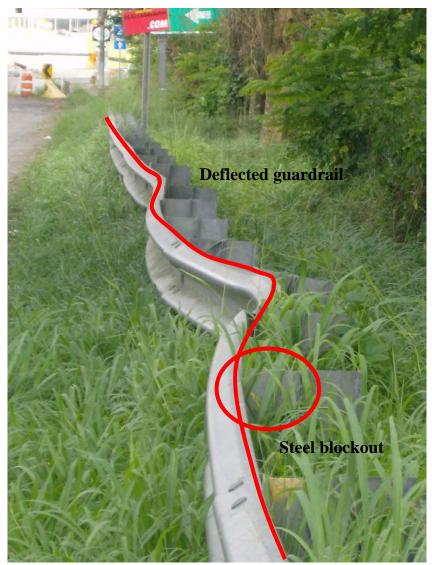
Section of W beam strong post guardrail on PR-2 km 172.0-172.1, Municipality of San Germán.
